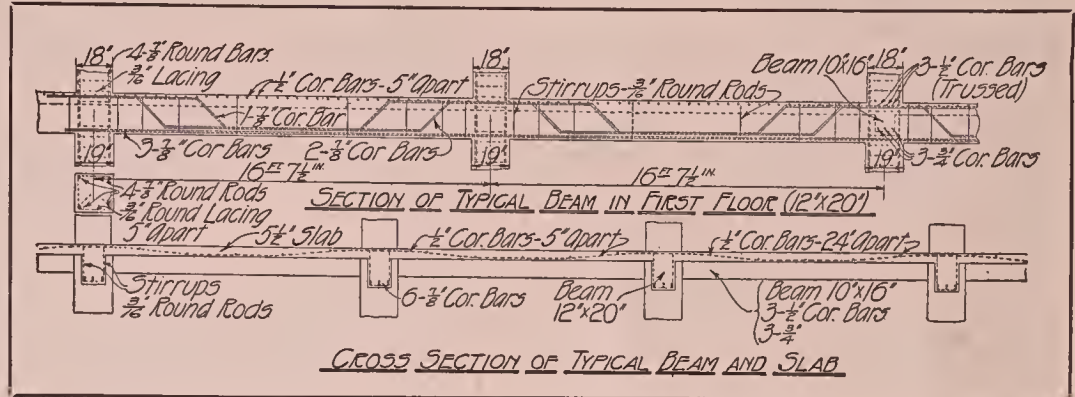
Details of Reinforcement of Typical Beam and Slab. (See p. 52.)
